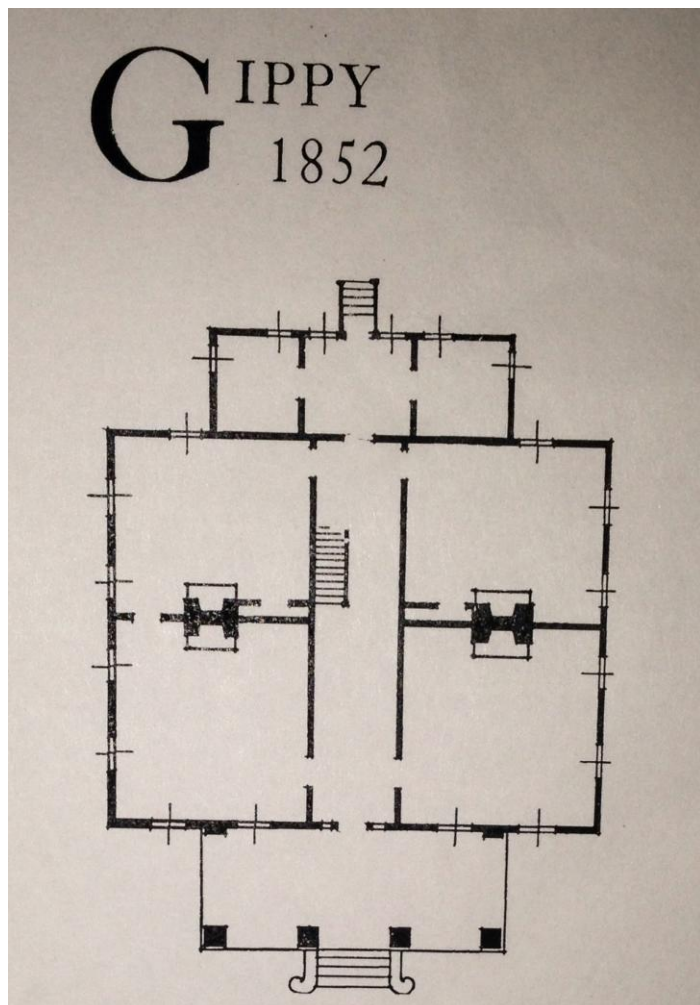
1852 floor plan of Gippy plantation, Samuel Gaillard Stoney, Plantations of the Carolina Low Country.
